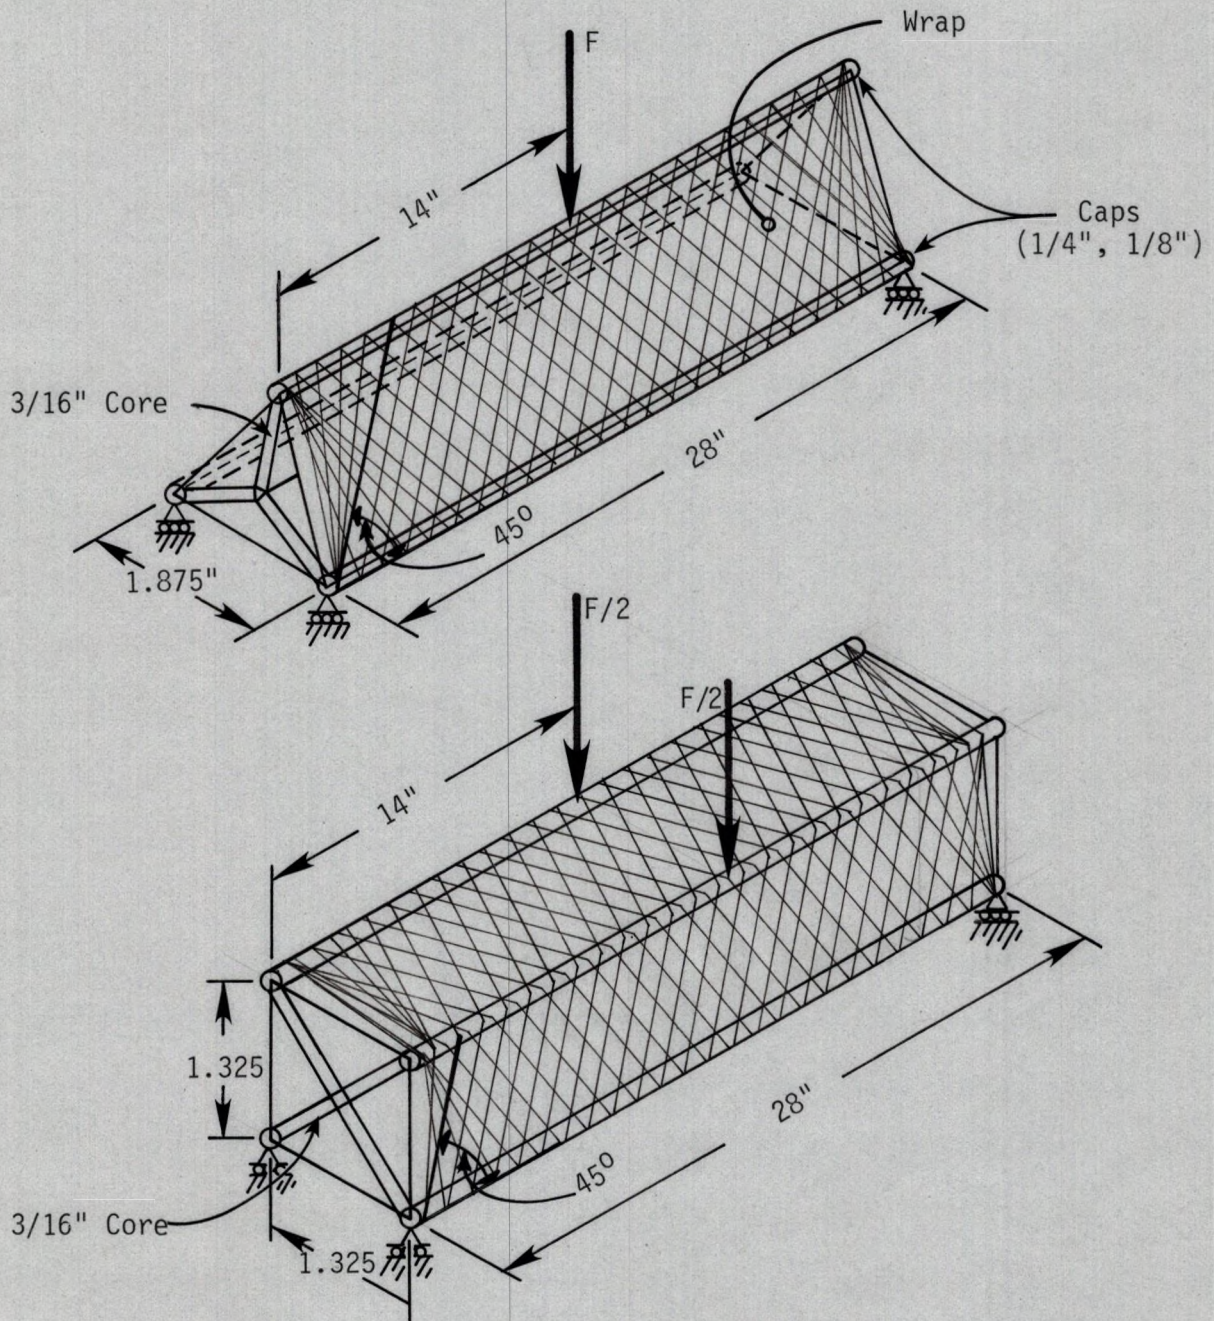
CAPTIVE COLUMN TEST SPECIMENS
